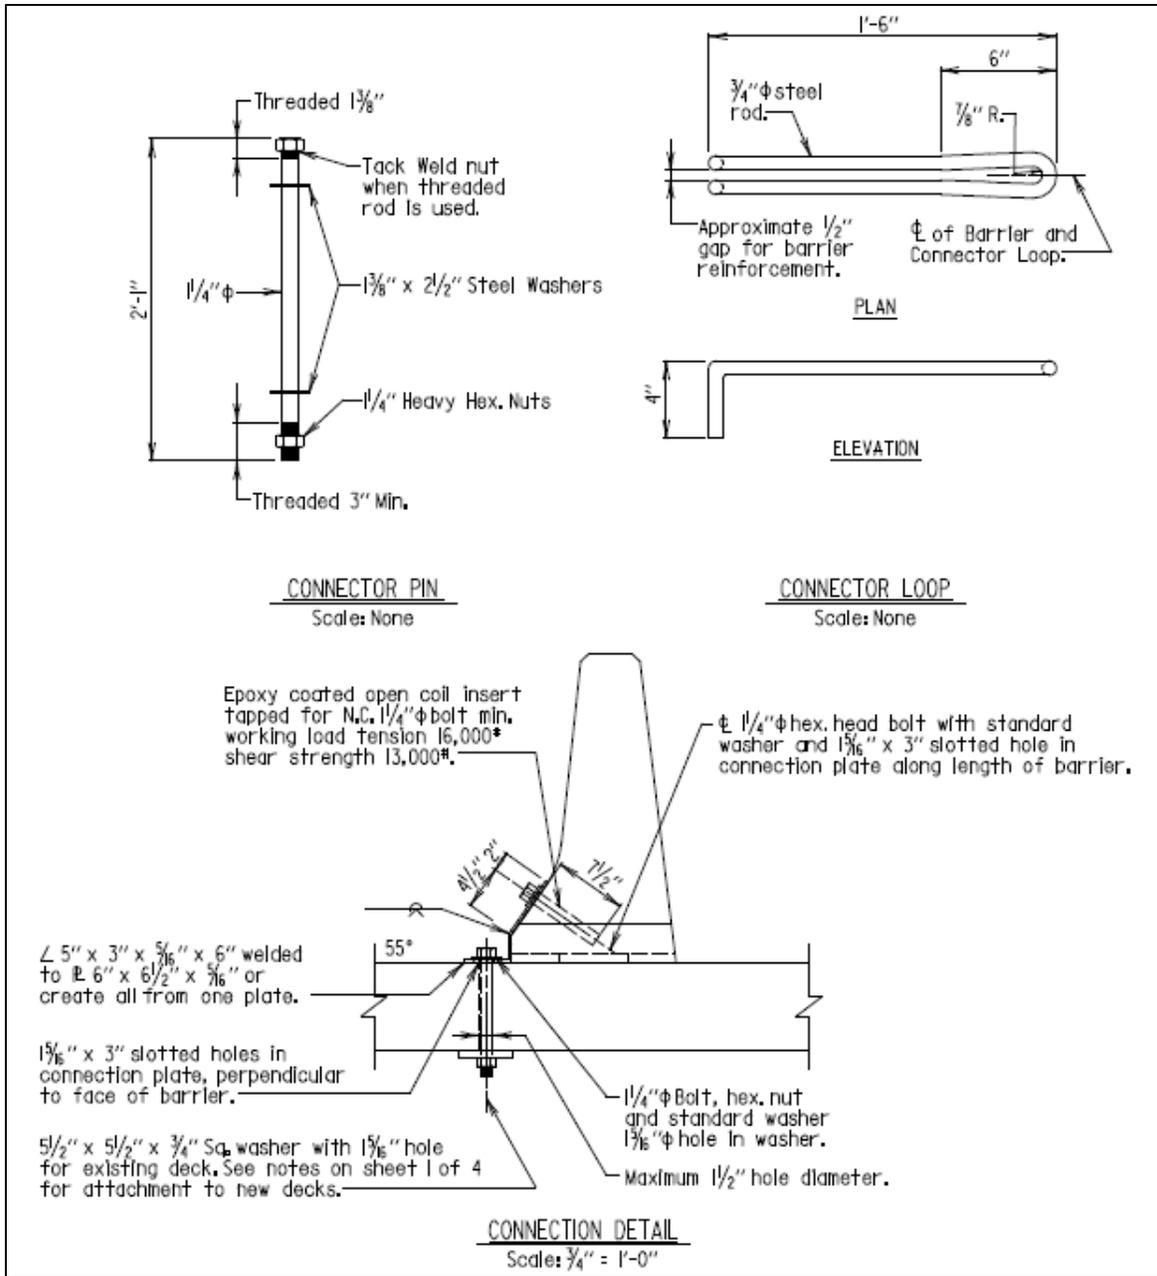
Originally Proposed Design (Not to Be Used for Construction)—Connector Details.
